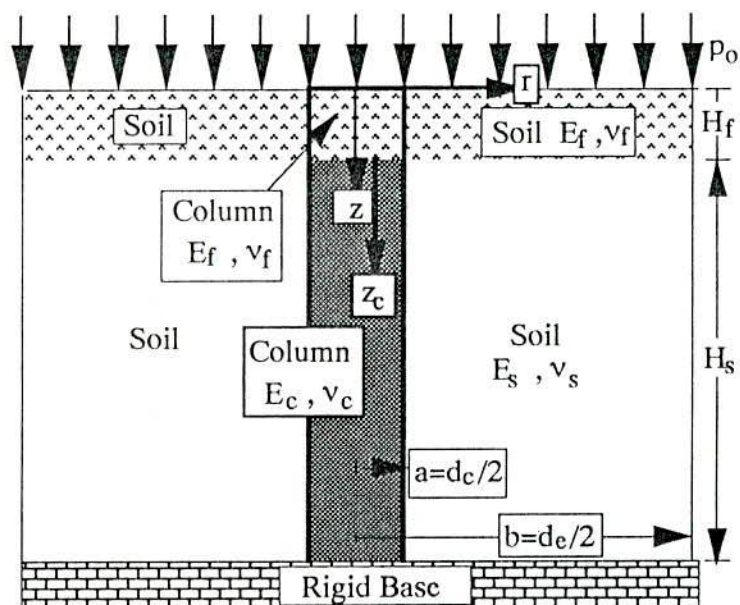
Foundation model for soft ground reinforced by columnar inclusions and covered by a layer of granular fill.
